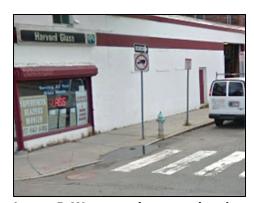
Water pools at a pedestrian ramp on the southeast corner of the Windsor Street intersection.
